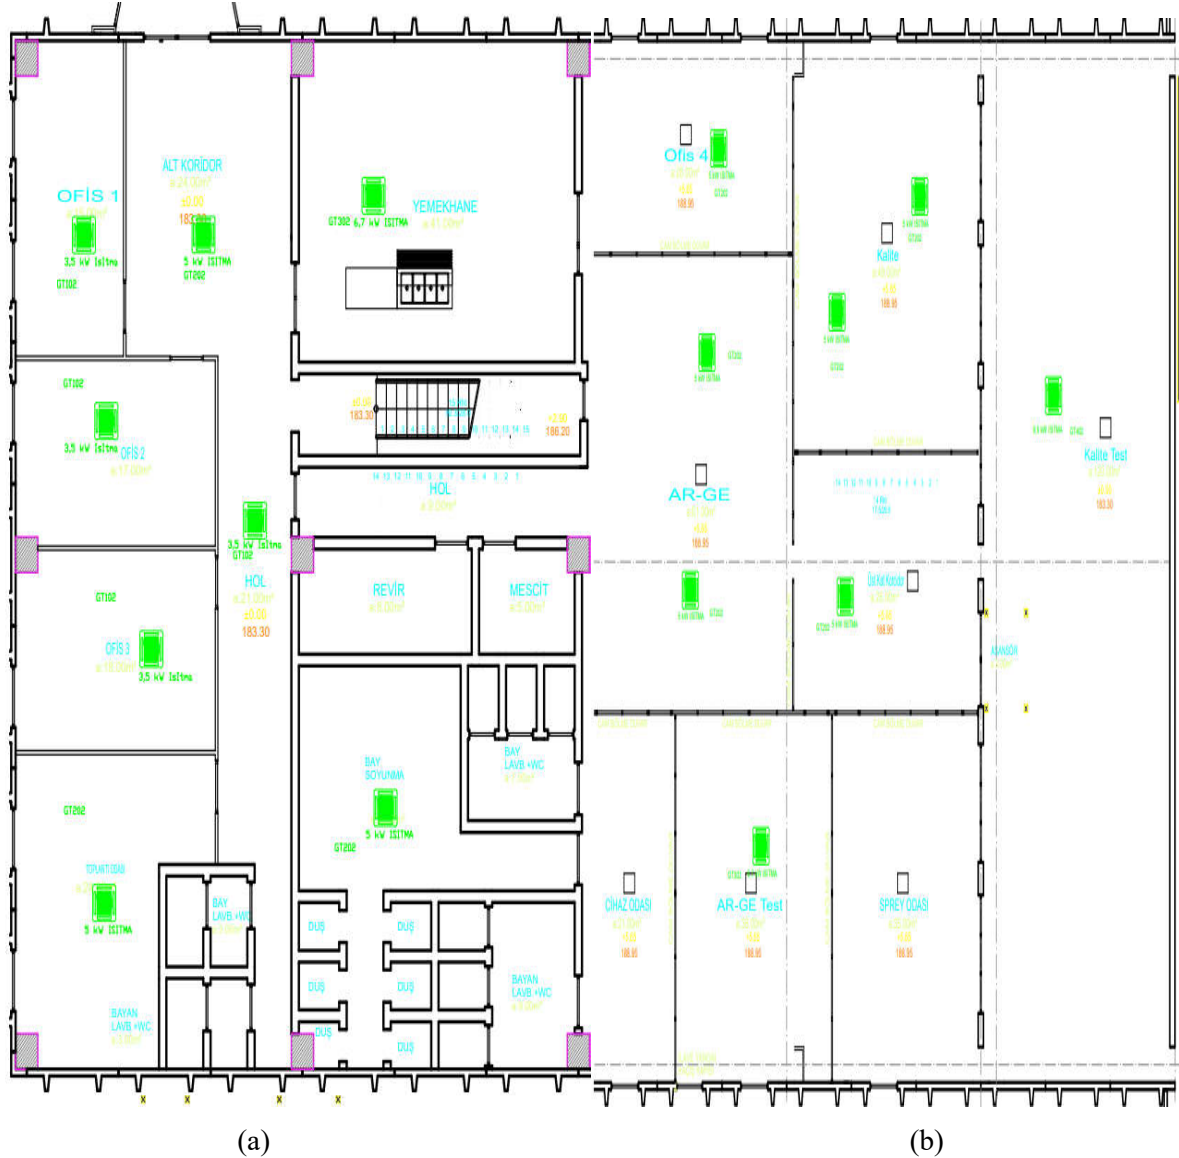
Fancoil positioning project (a) lower floor (b) upper floor
